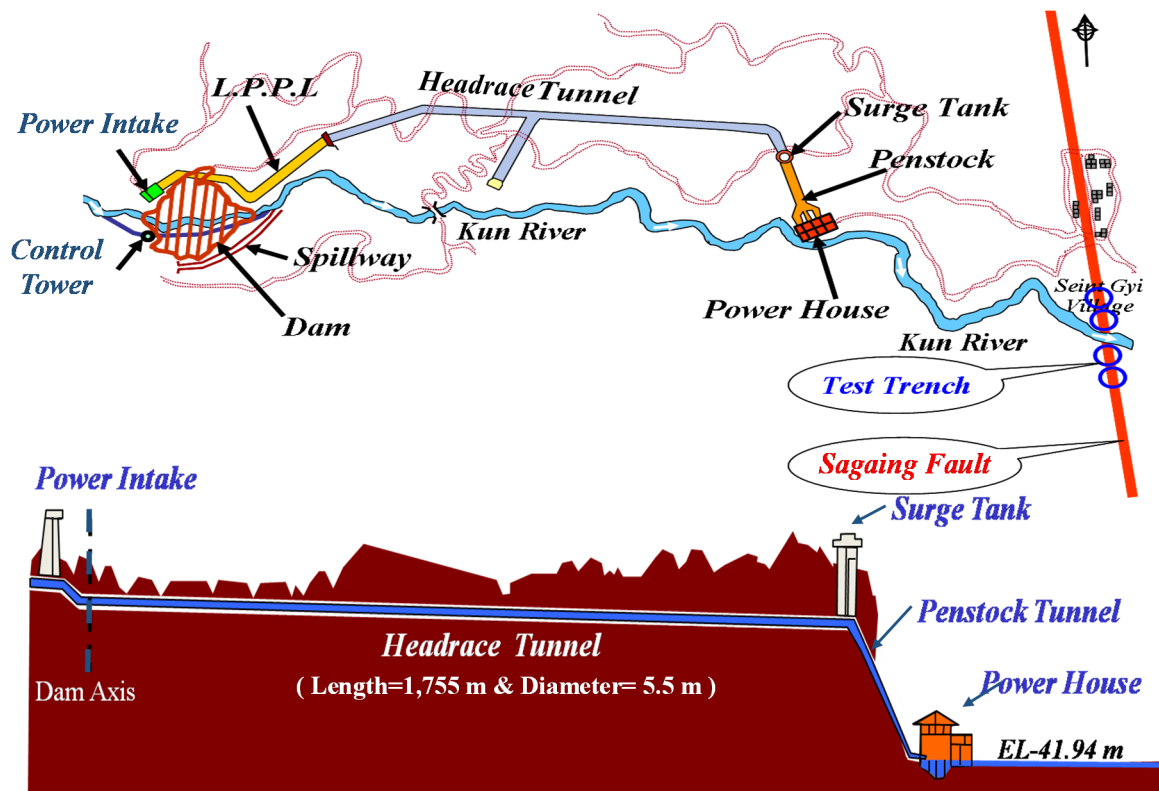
General Layout of Kun Hydropower Project (Source: KEPCO, 2008)
